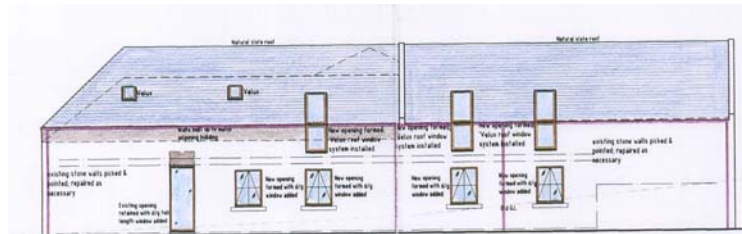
Originally proposed western elevation (rear of Property 2). Broken line identifies the existing ridge line.
